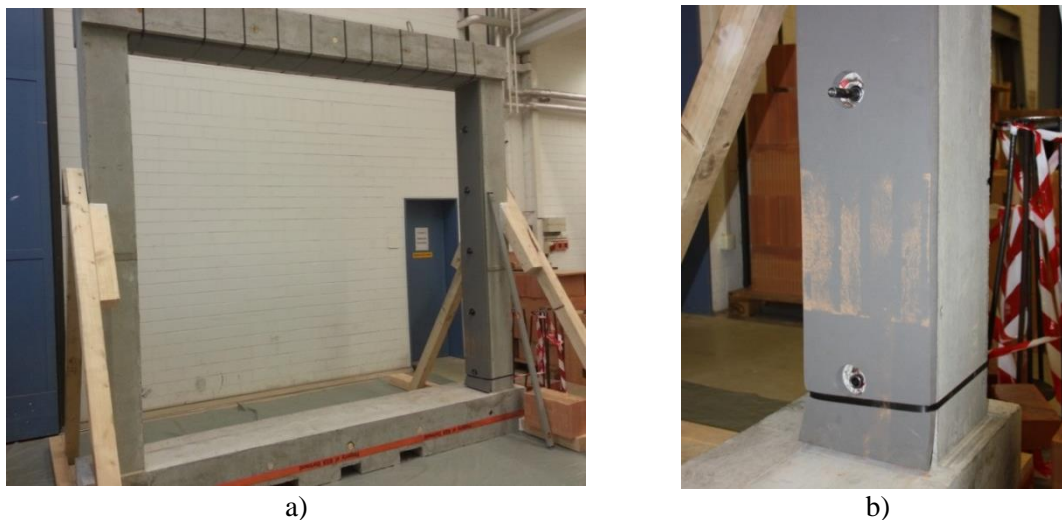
a) Prefabricated RC frame with elastomer at columns and upper beam and b) installed anchors
